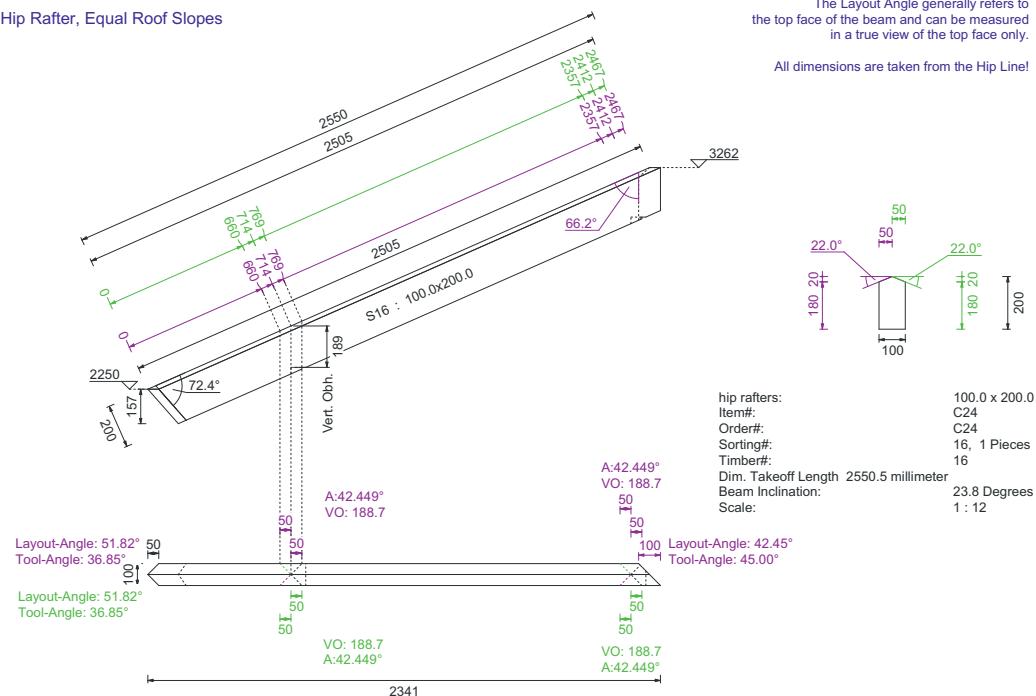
Example of a beam drawing from the beam program (Dietrich'AG, Taufkirchen)
